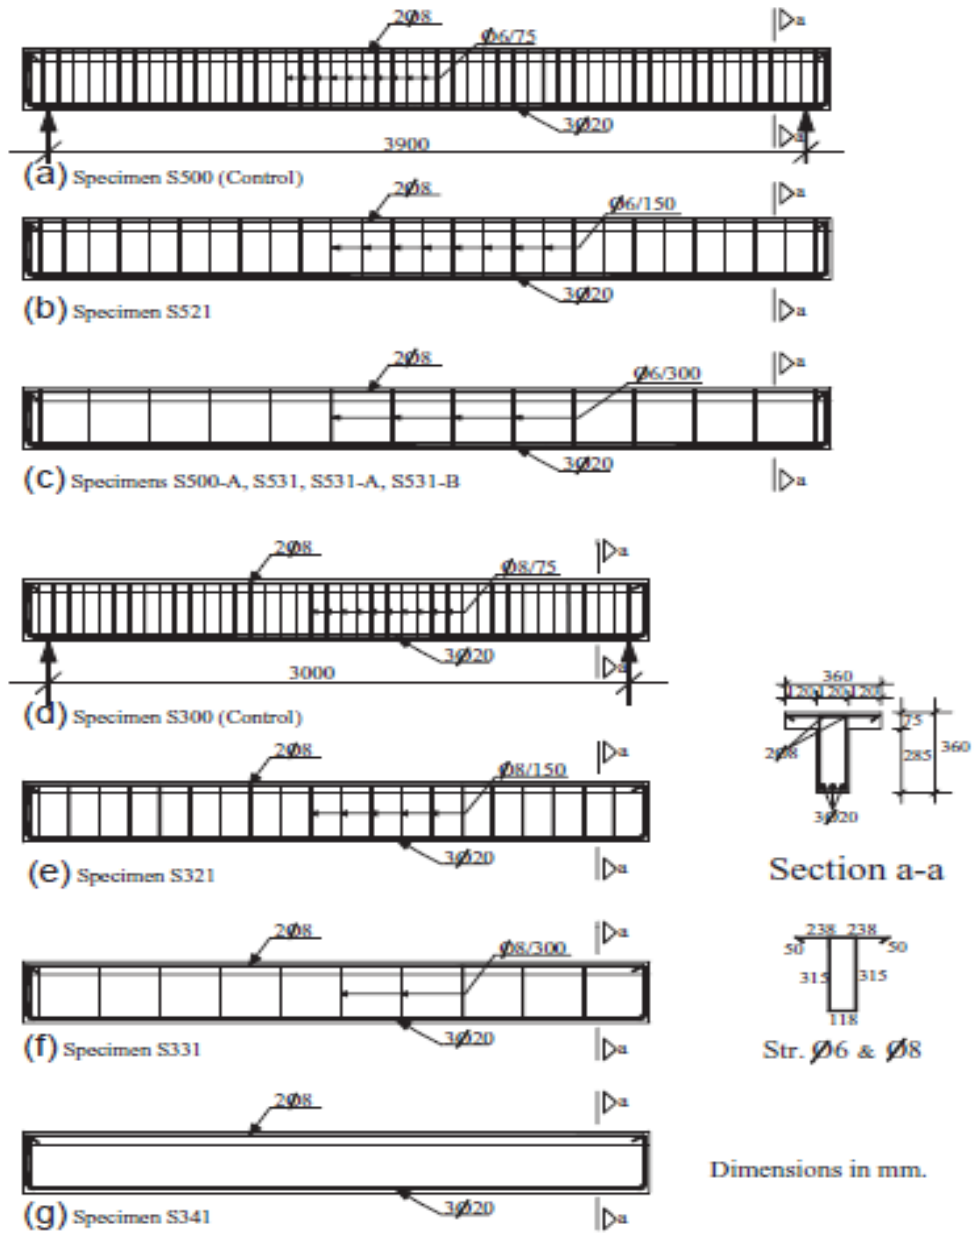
8- Reinforcement layout of specimens (Altin et al. 2003).
